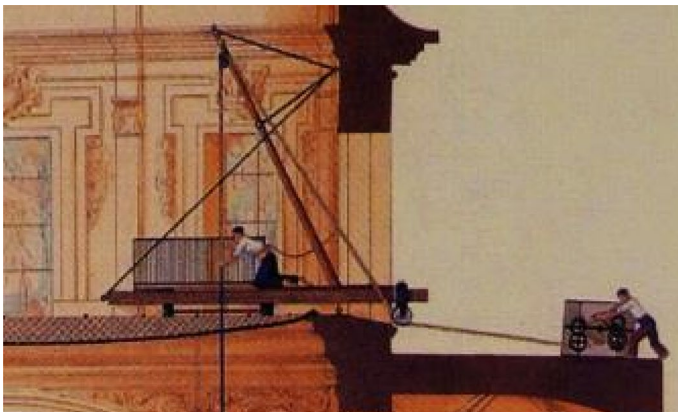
Mechanical drawing of operation. Main parts: masts, pulleys, winches and rope
